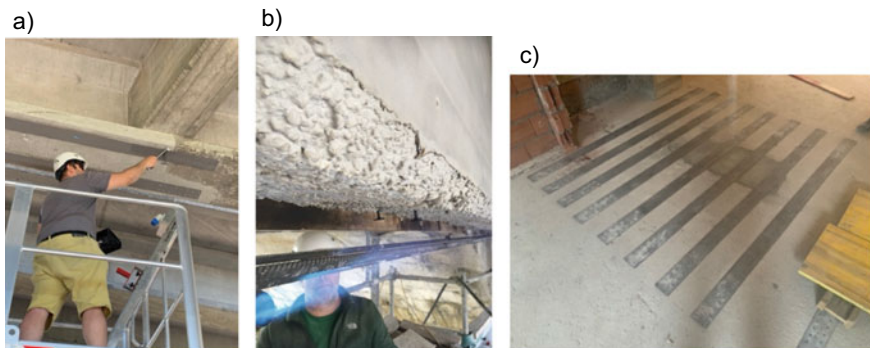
Externally unbonded Fe-SMA strips are installed for flexural strengthening of a bridge girder in Mörschwil, Switzerland (a), and a slab in Boncourt, Switzerland (c). The surface of a girder has been hydromechanically removed for strengthening in Courrendlin, Switzerland, using the cover replacement method (b). The reason for strengthening was corroded reinforcement and insufficient load-carrying capacity (a), destroyed prestressing strands and replacement of reinforcement (b), and insufficient internal reinforcement (c)
